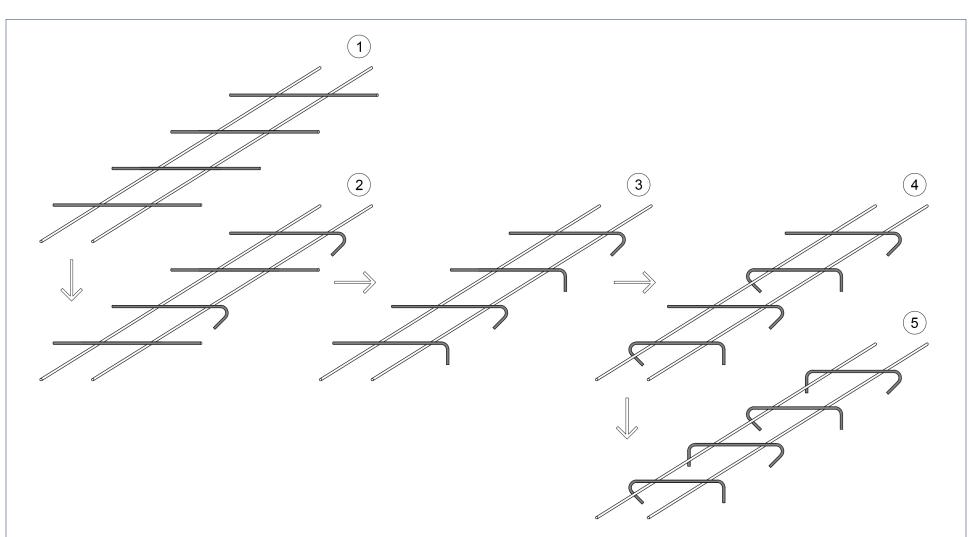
Schematic of sequential bending on a WWR line bender to achieve alternating hooks.
